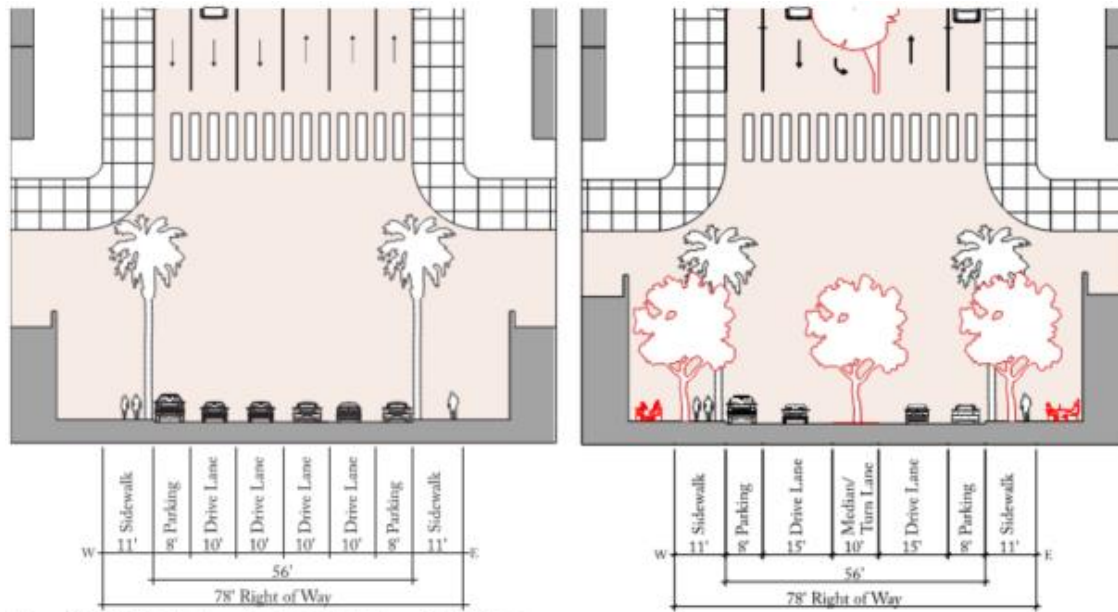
Whittier Boulevard -- Montebello Boulevard to Bluff Road
